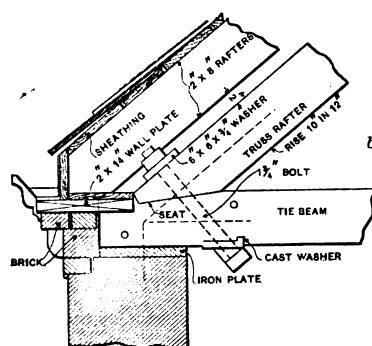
Construction of Joint for Truss Shown in Fig. 10, November Issue, When Rafters are Supported on Purlin.
